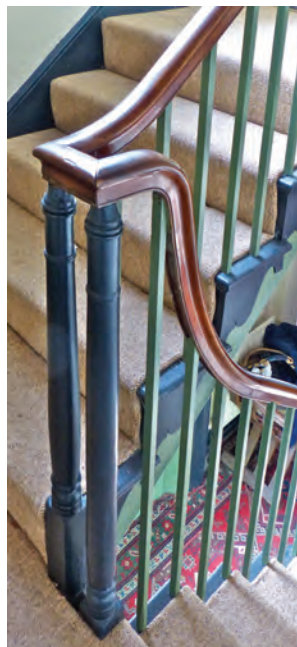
Kingsbury Episcopi, Manor House. Ramped handrail and decorative brackets to treads
